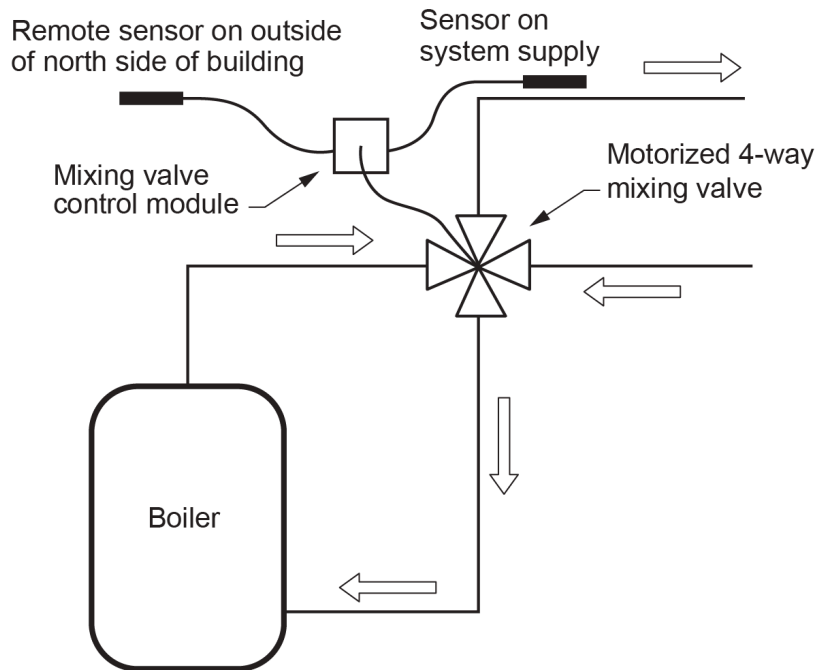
Four-way mixing valve piping arrangement. (Skilled Trades BC, 2021) Used with permission.
